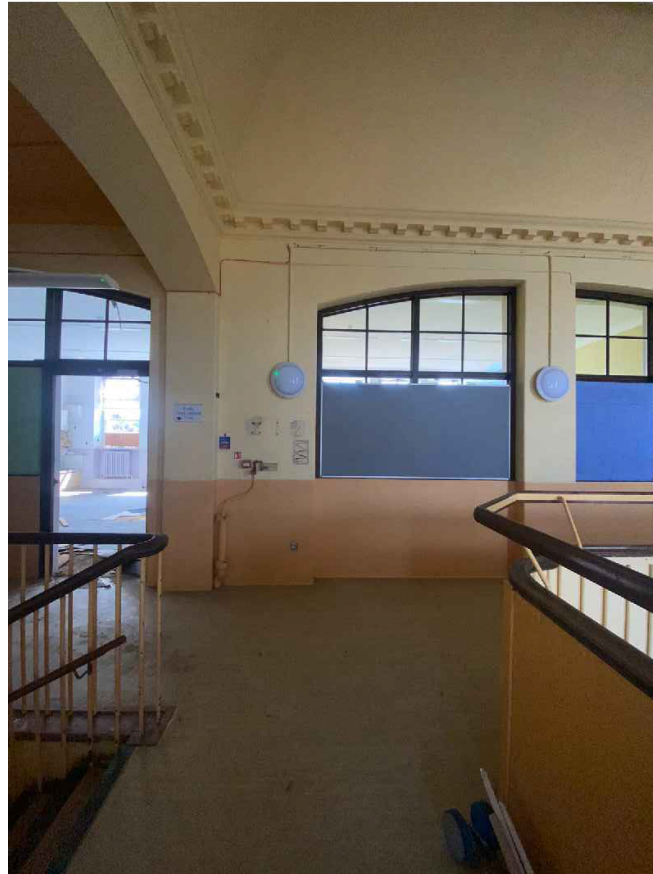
General view of Room 1/5 to the north of the balcony area, looking north-east (© Trail Architects 2024)
